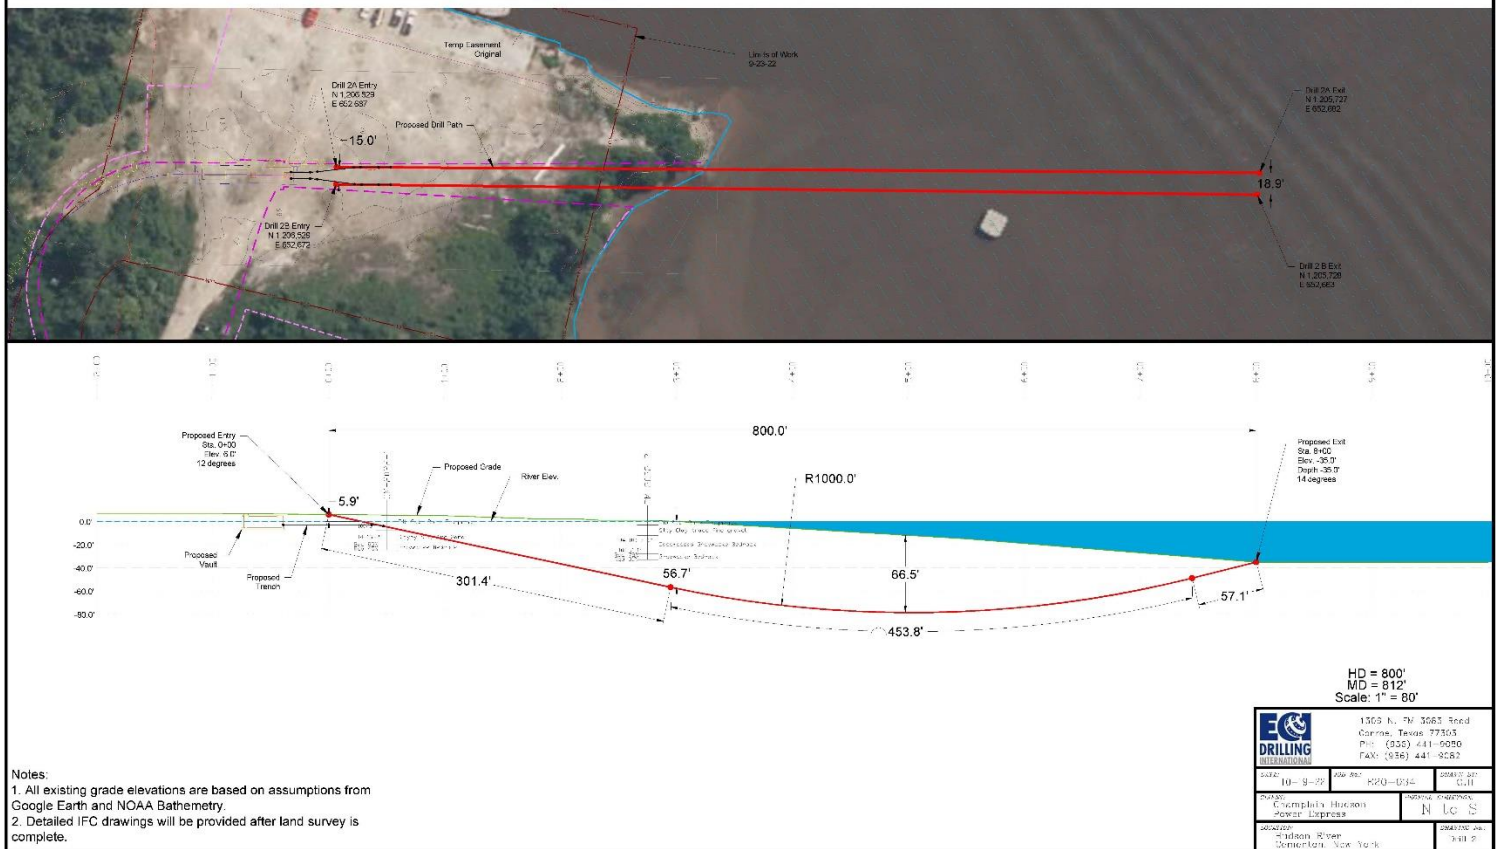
HDD Plan and Profile Drill - Cementon, NY
